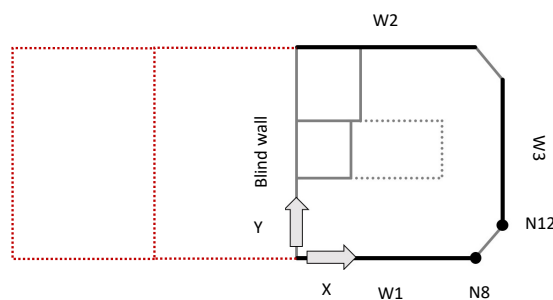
Scheme of the structural plan of the first storey, with the identification of the two main directions X and Y, façade walls W1 to W3, the blind wall, and control nodes N8 and N12. “Tabique” walls, which were not considered in the modelling, are here denoted in grey dots. As demonstrated in this scheme, the blind wall is actually the physical boundary that separates the case study building from the adjacent one (represented in red dots).
